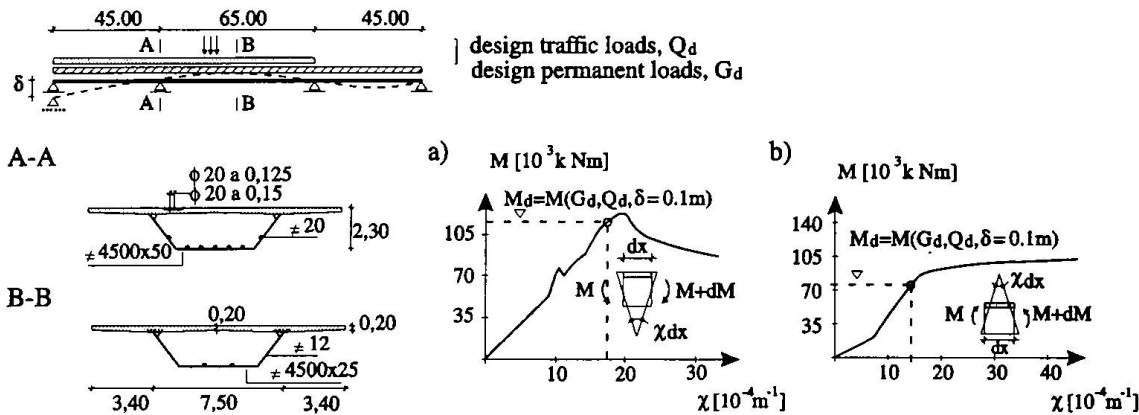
Composite box girder bridge with typical cross-sections and their behaviour in terms of moment vs. curvature, a) at the support (section A-A), b) in the span (section B-B).
